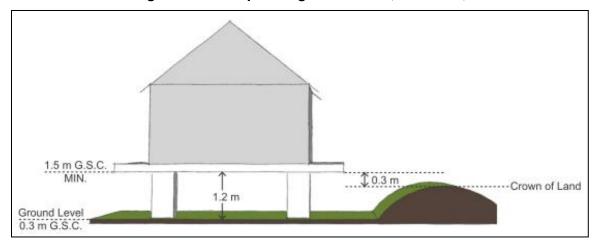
Floodproofing Provisions (B/L 3249-2022)
